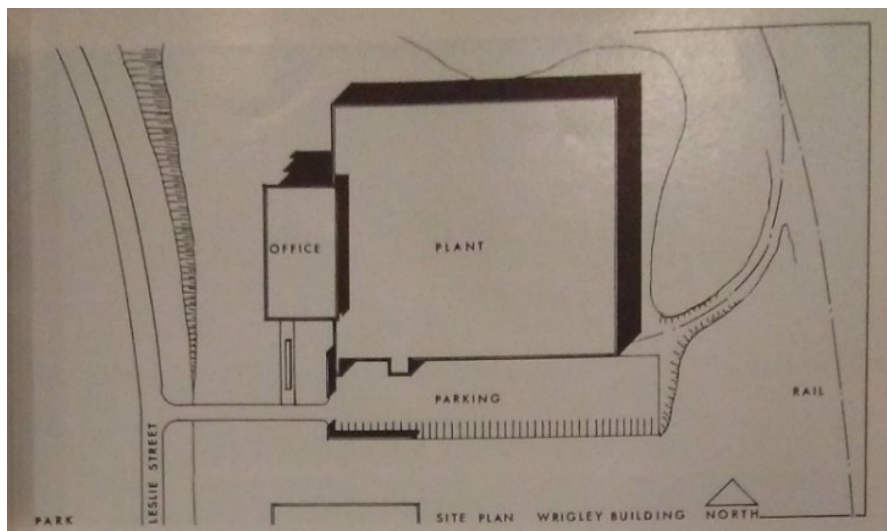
Site plan showing the original office, onsite parking area, plant and relationships to Leslie Street and railway (RAIC Journal, Vol. 40, No. 7, July 1963)
